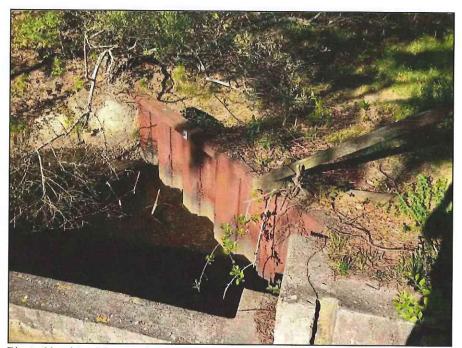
The steel sheet pile wall right of the fish ladder viewed from the fish ladder.
